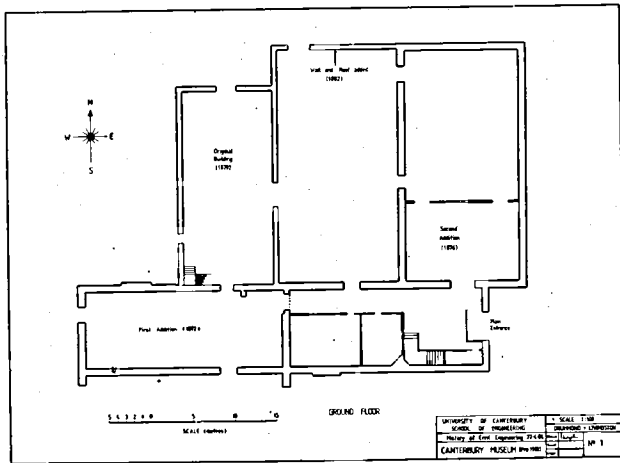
Ground floor plan of the Canterbury Museum, Christchurch
